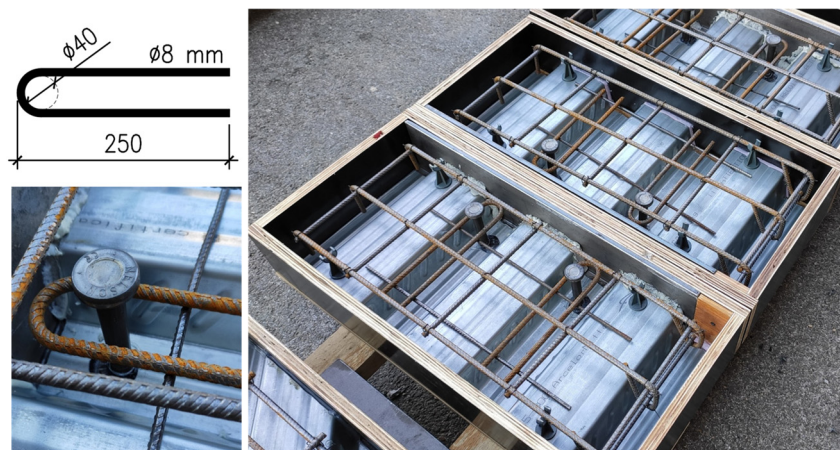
U-bar geometry and specimens with stirrups before concrete casting.
